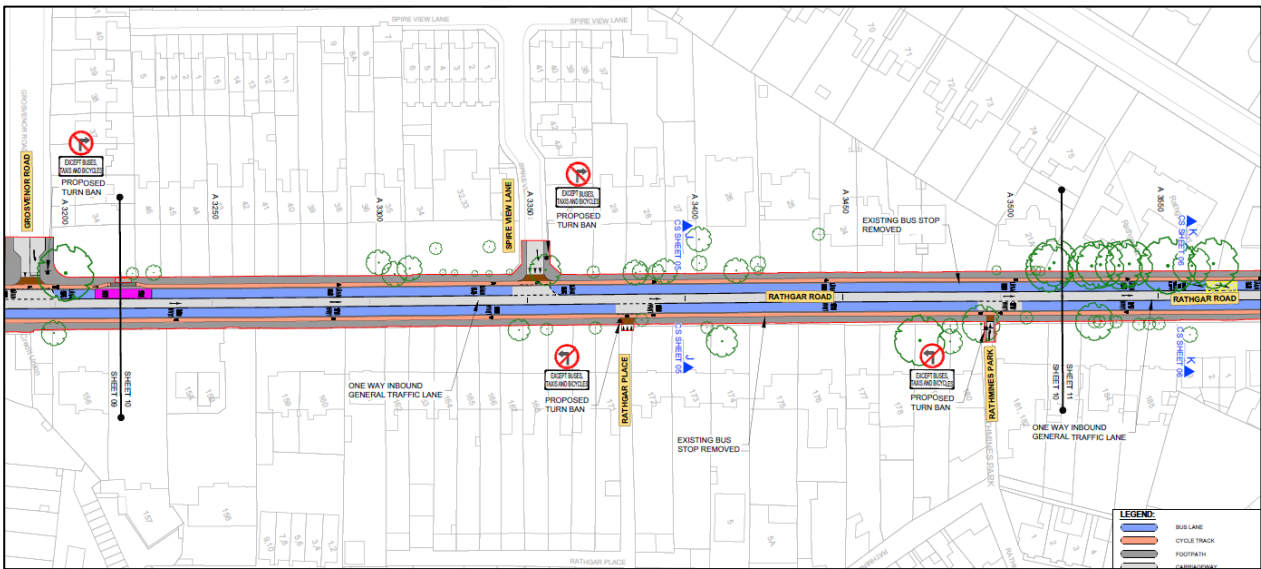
Extract from General Arrangement Drawings (Sheet 10)
